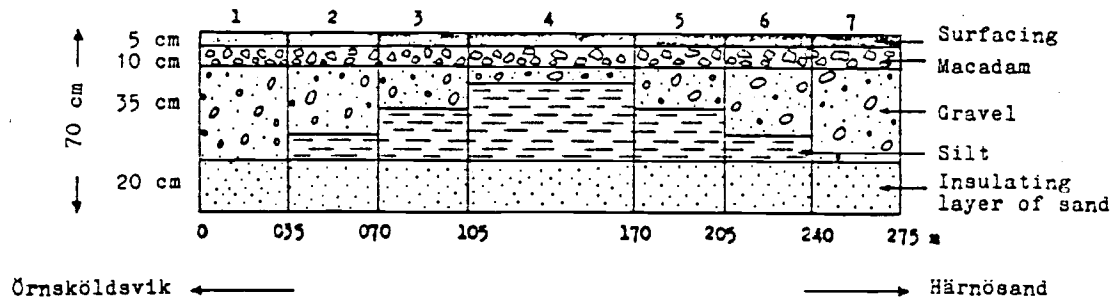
Cross section of the test road at Bjästa, Sweden (after Rengmark (60)).
